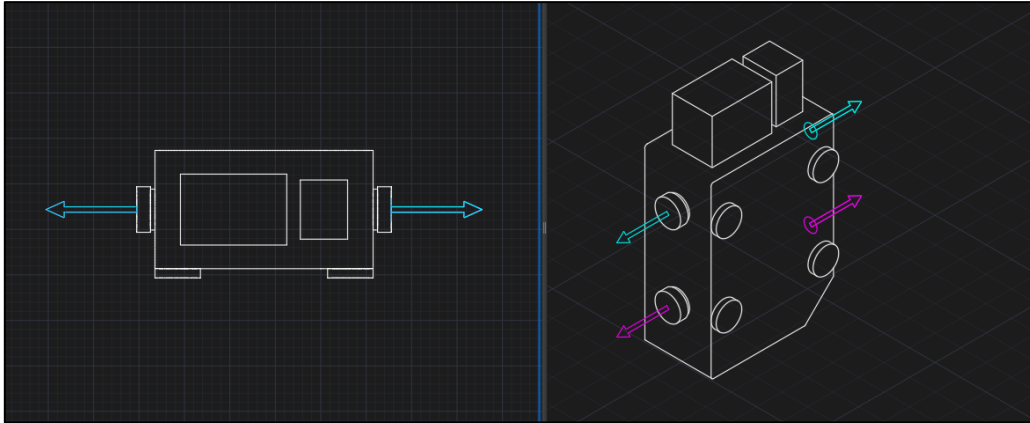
Shunt unit inserted in to MagiCAD project and AutoCAD drawing
